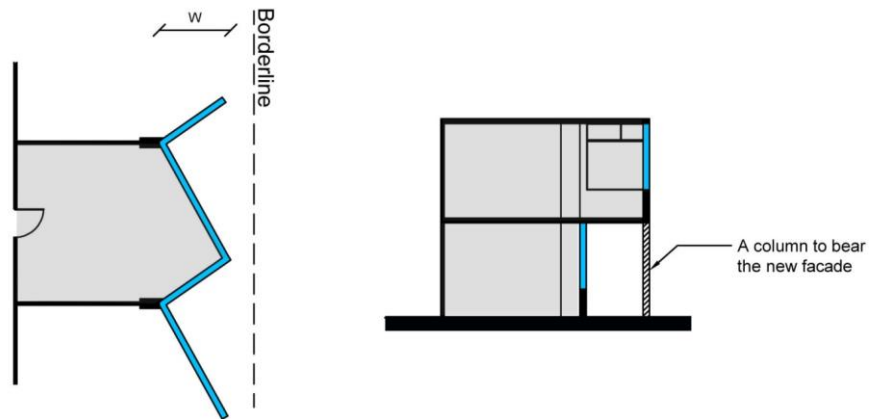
Diagrams that show the way a multi-angled façade unit is connected to a building façade according to scenario 1
